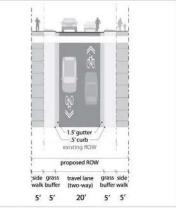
Neighborhood Street Expanded ROW -30' ROW + Natural Drainage Section Cut B (for use where on-street parking is important)
